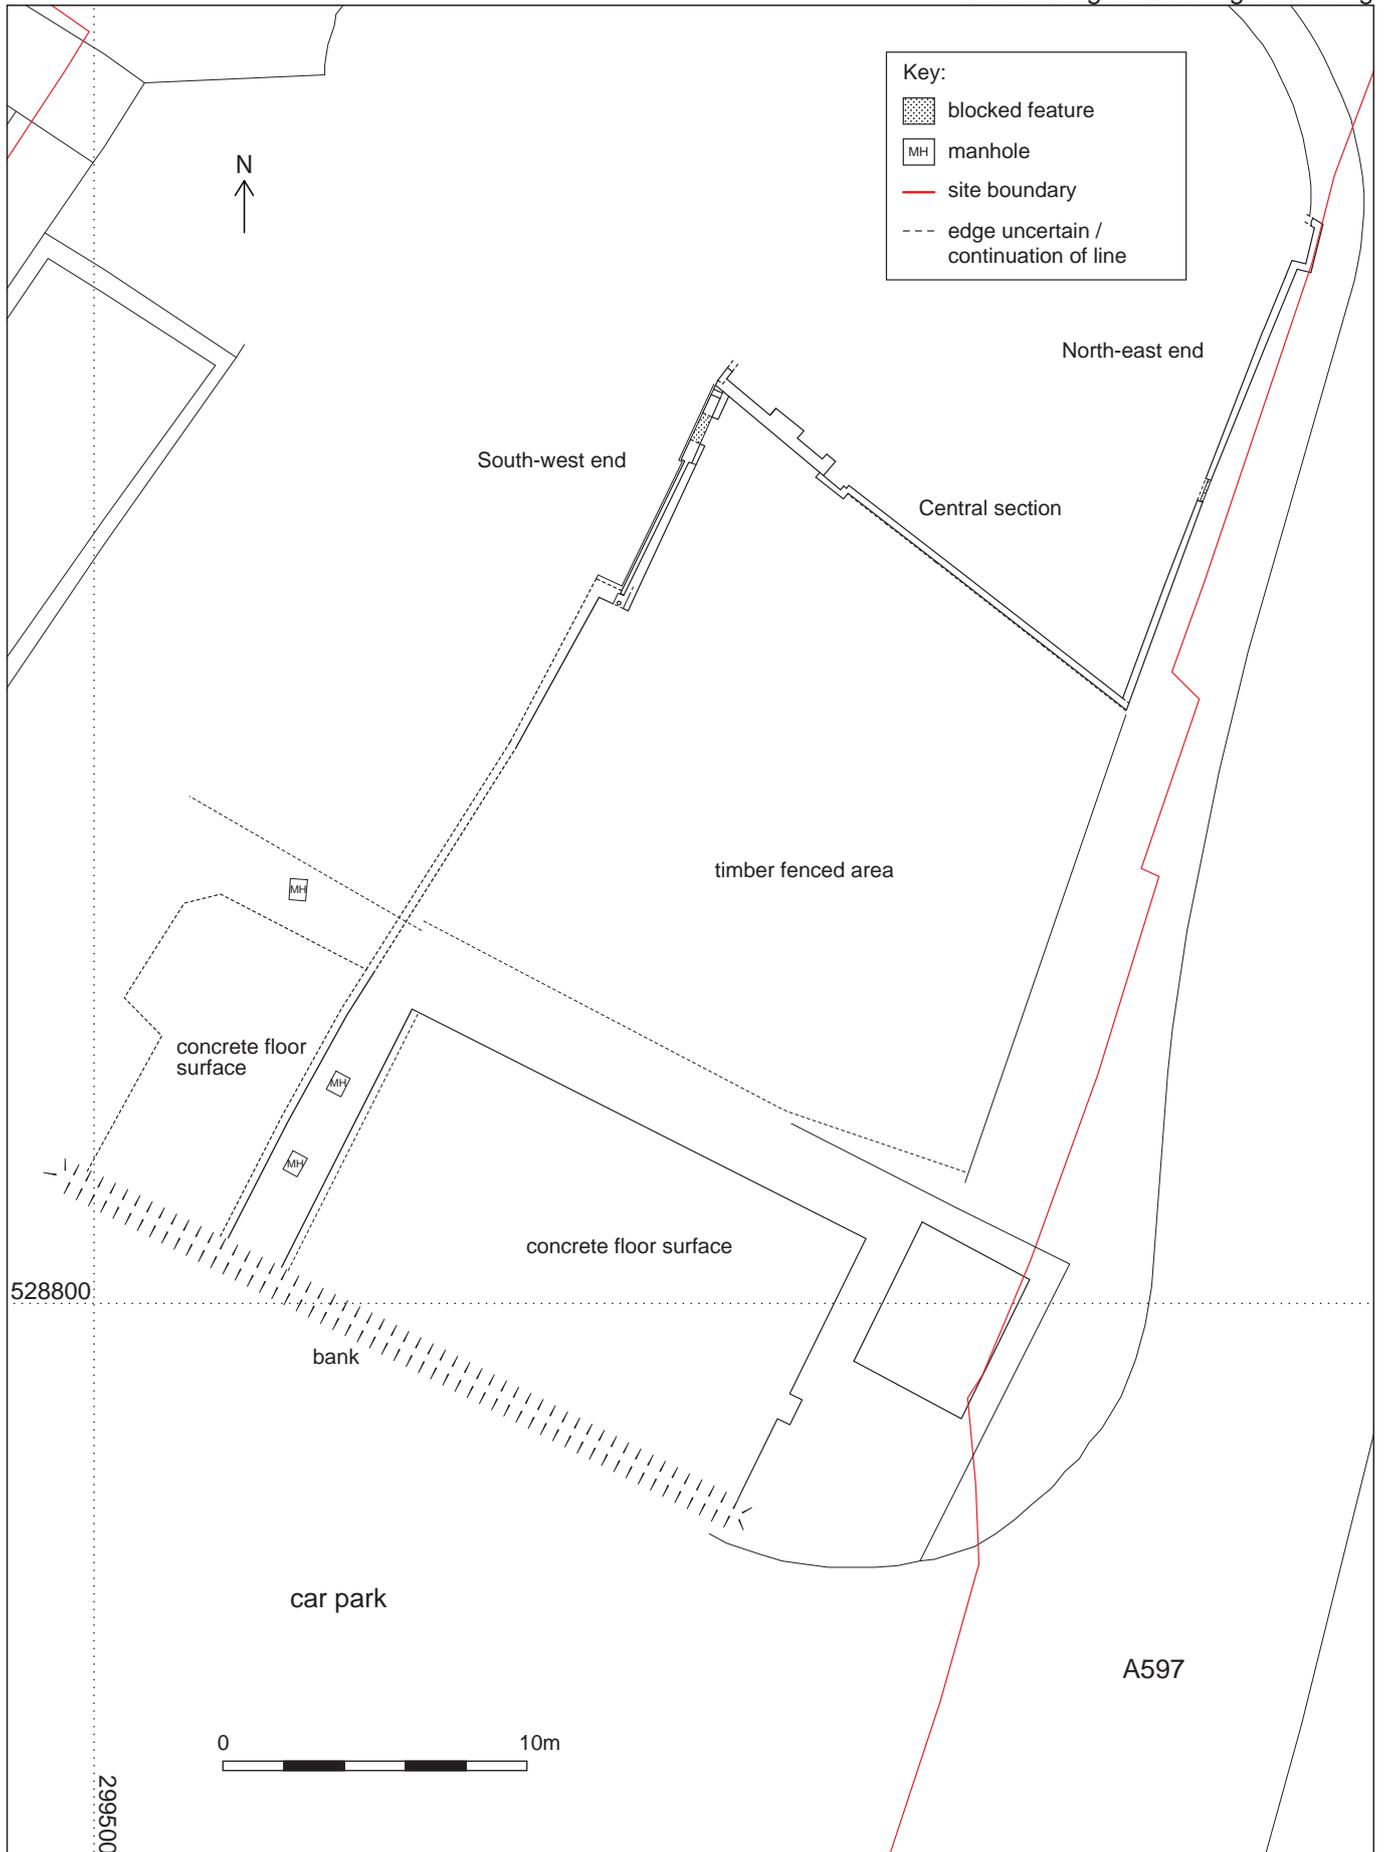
Plan of walls and concrete floor surfaces at the north end of the site
